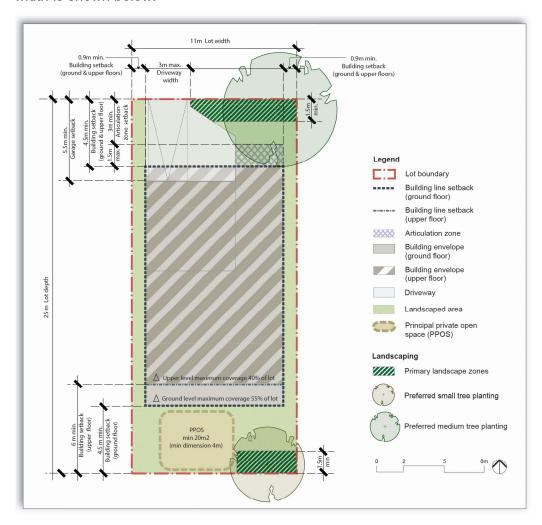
Example of Proposed Driveway and Garage – 11 metre lot width
